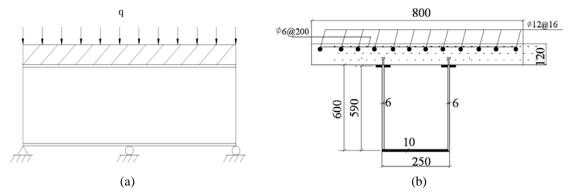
Construction diagram a) and Section dimension b) of composite box-beam
